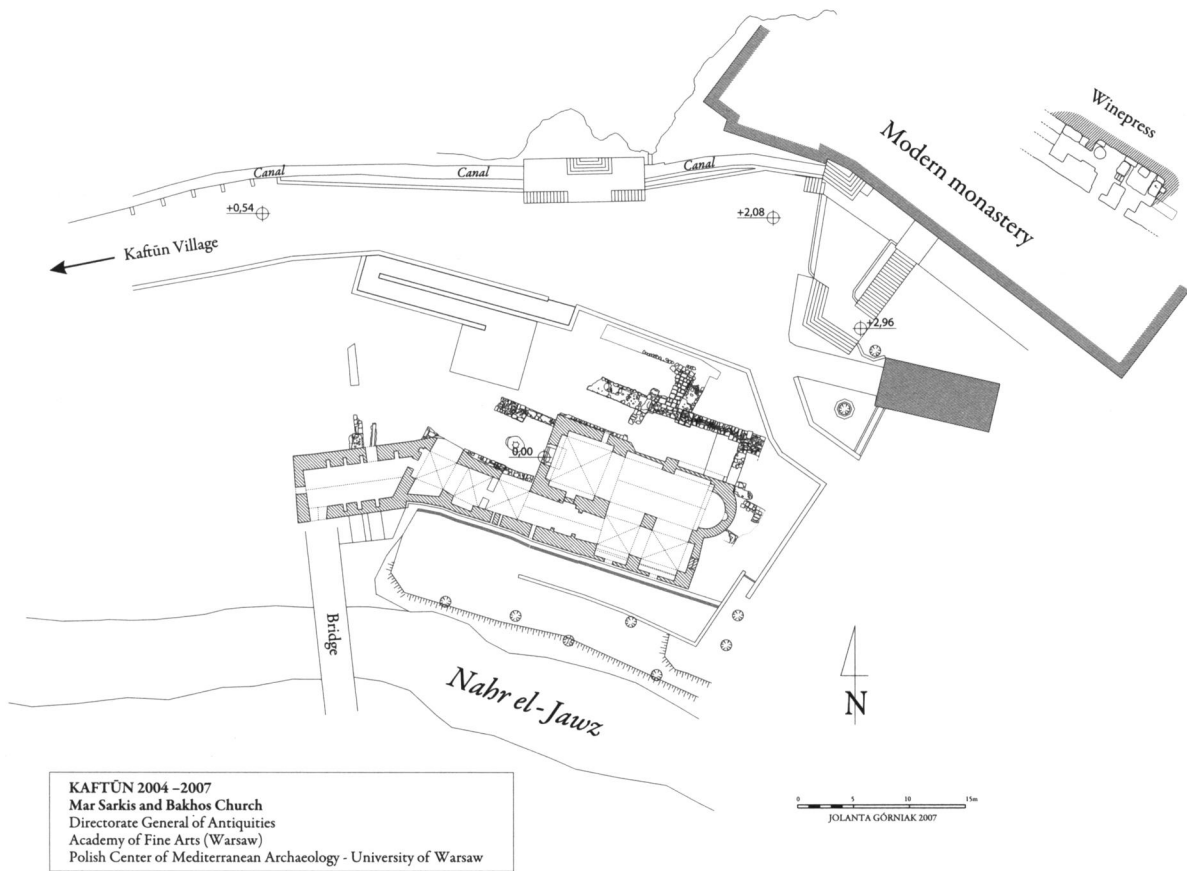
Plan of the church and its immediate surroundings (J. Juchniewicz).
